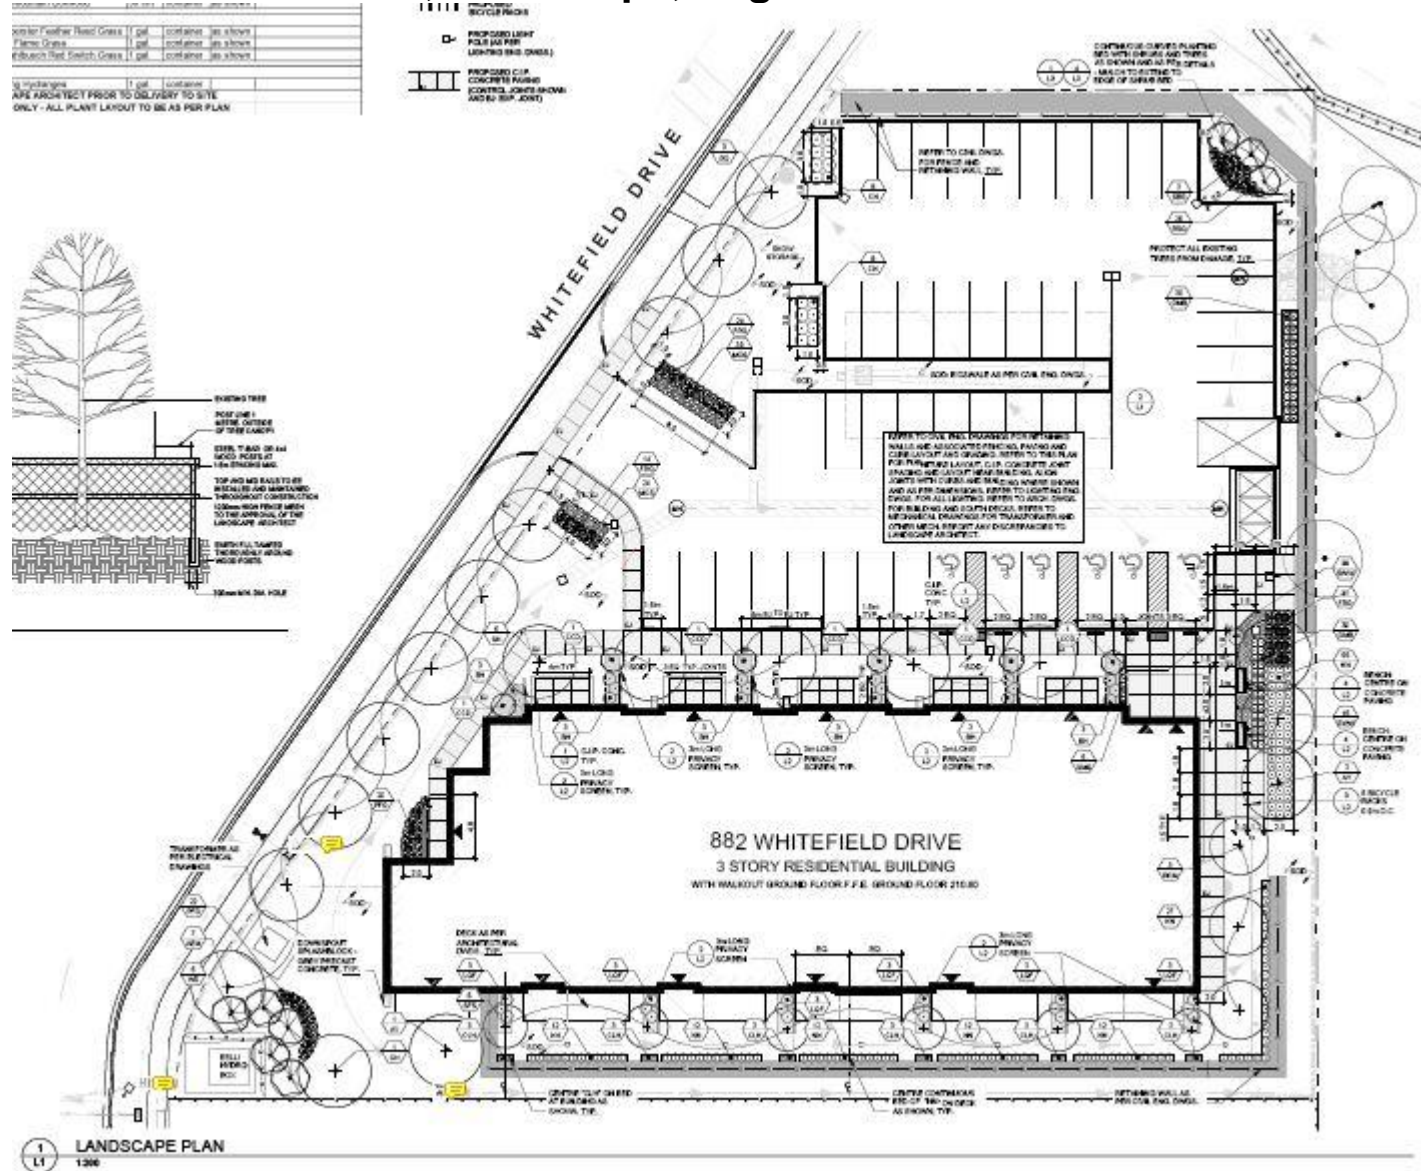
Exhibit B – Site Plan, Servicing and Grading Plan, Page 2 of 6NOTES:
